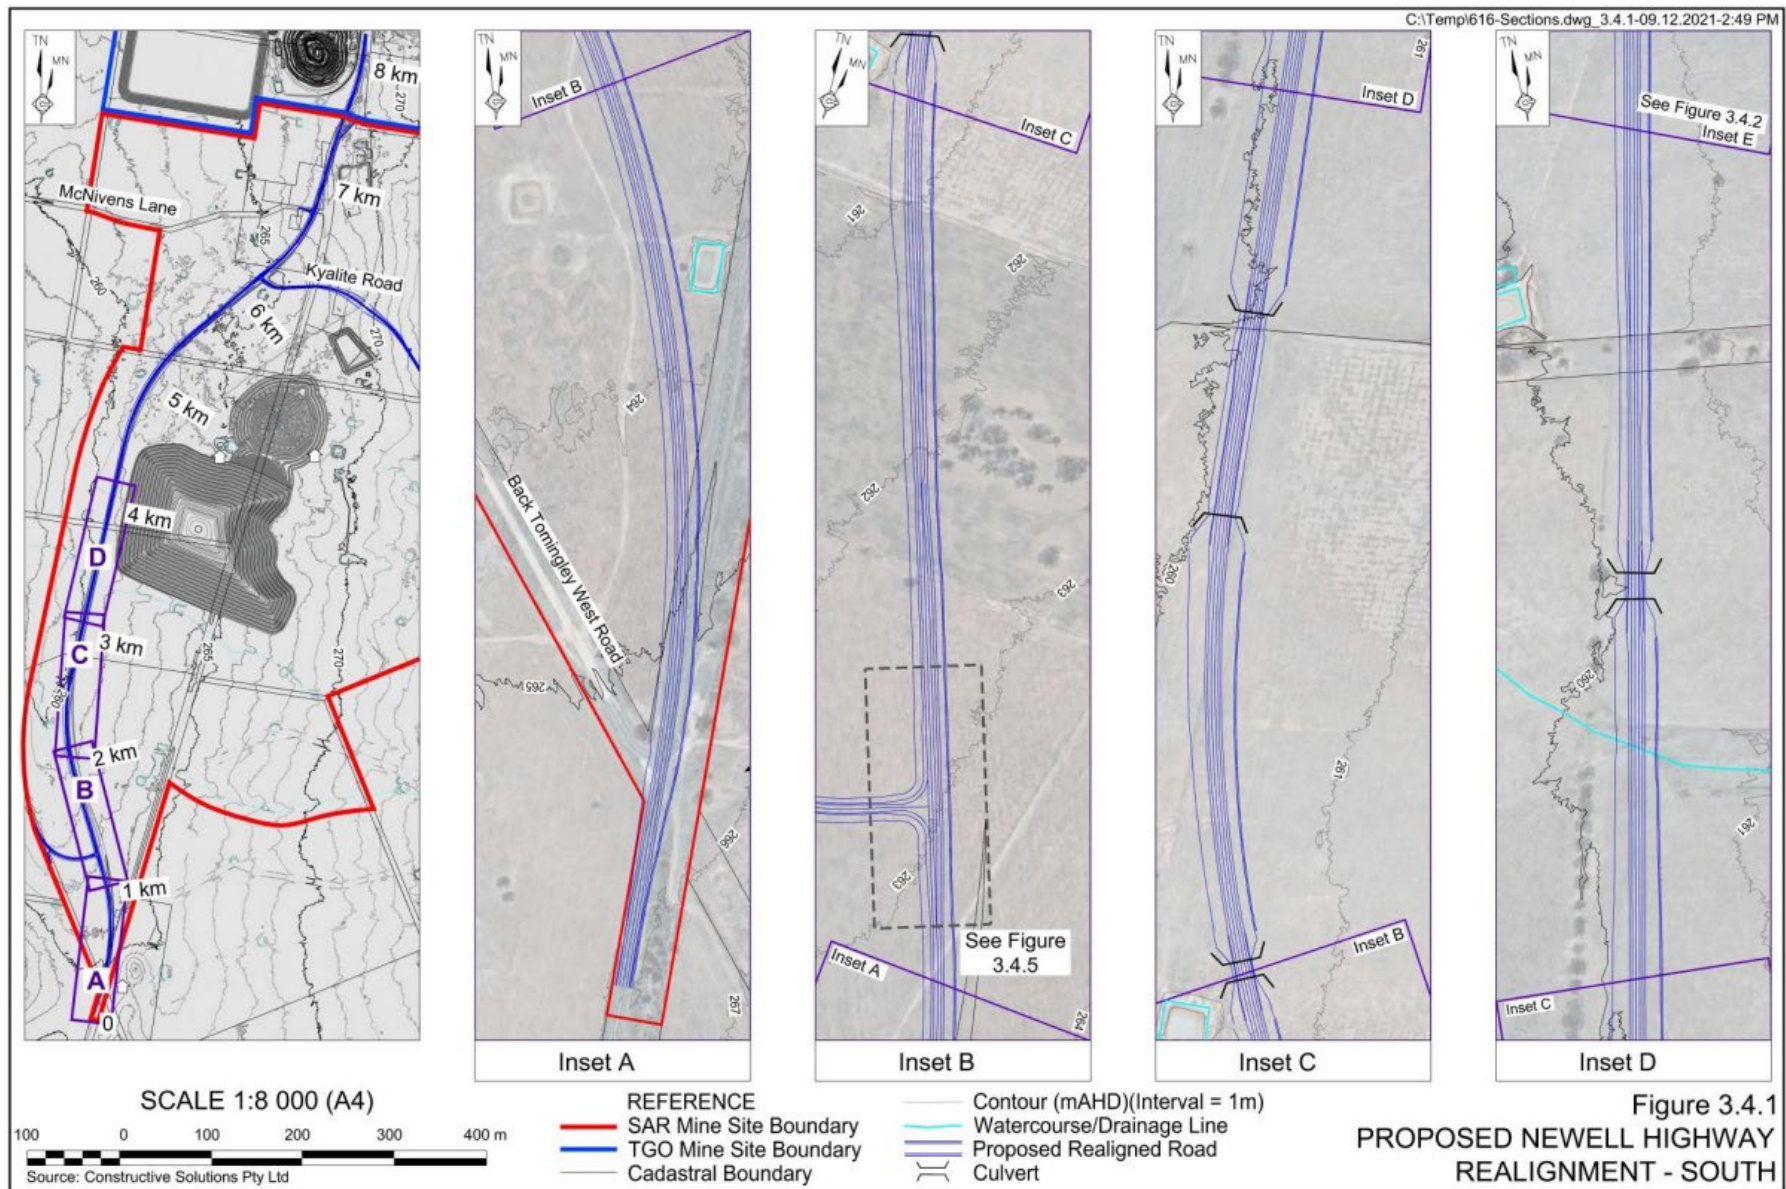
Newell Highway Realignment South Conceptual Development Layout
